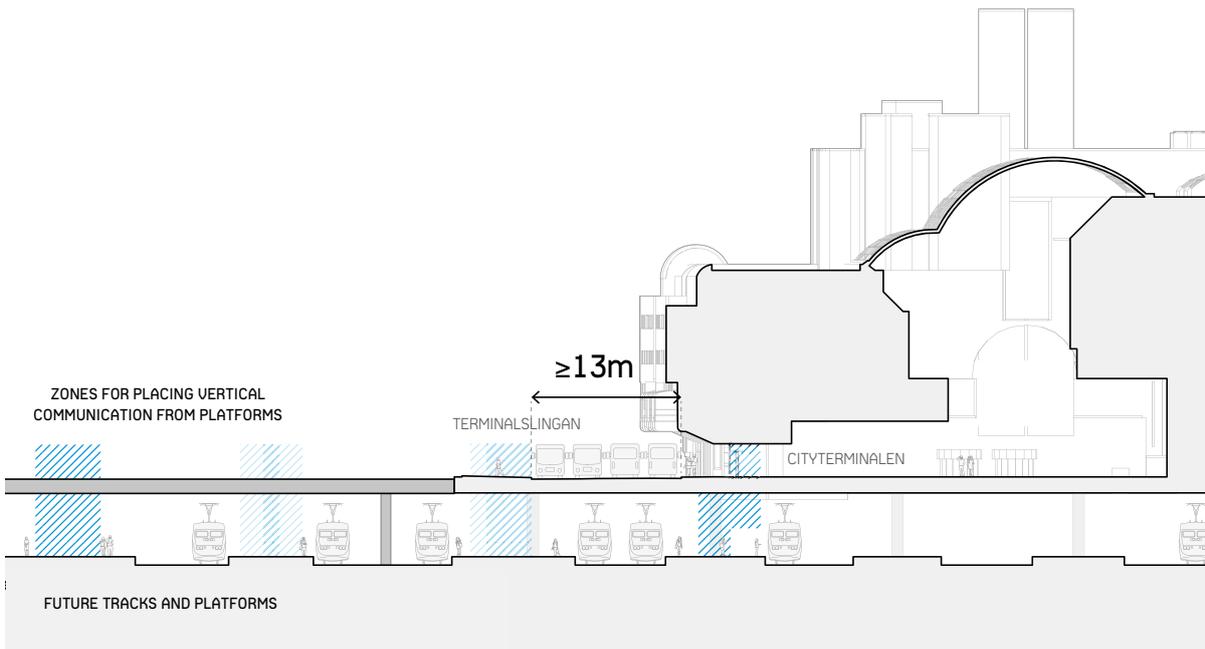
Cross section of Terminalslingan and Cityterminalen facing north, the future decking, new tracks and platforms
